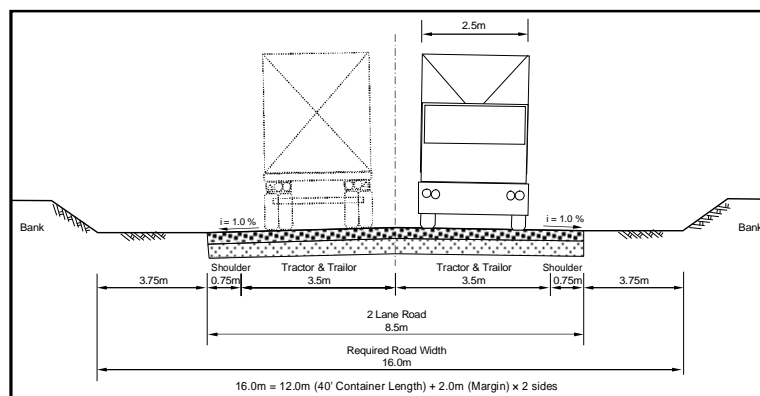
Plan Width of South Side Access Road
